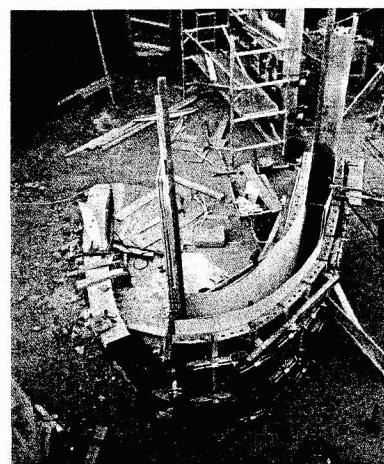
Rammed earth wall under construction at the Bird in Bush nursery, London, 2003 (JM Architects/In Situ Rammed Earth Co.).
